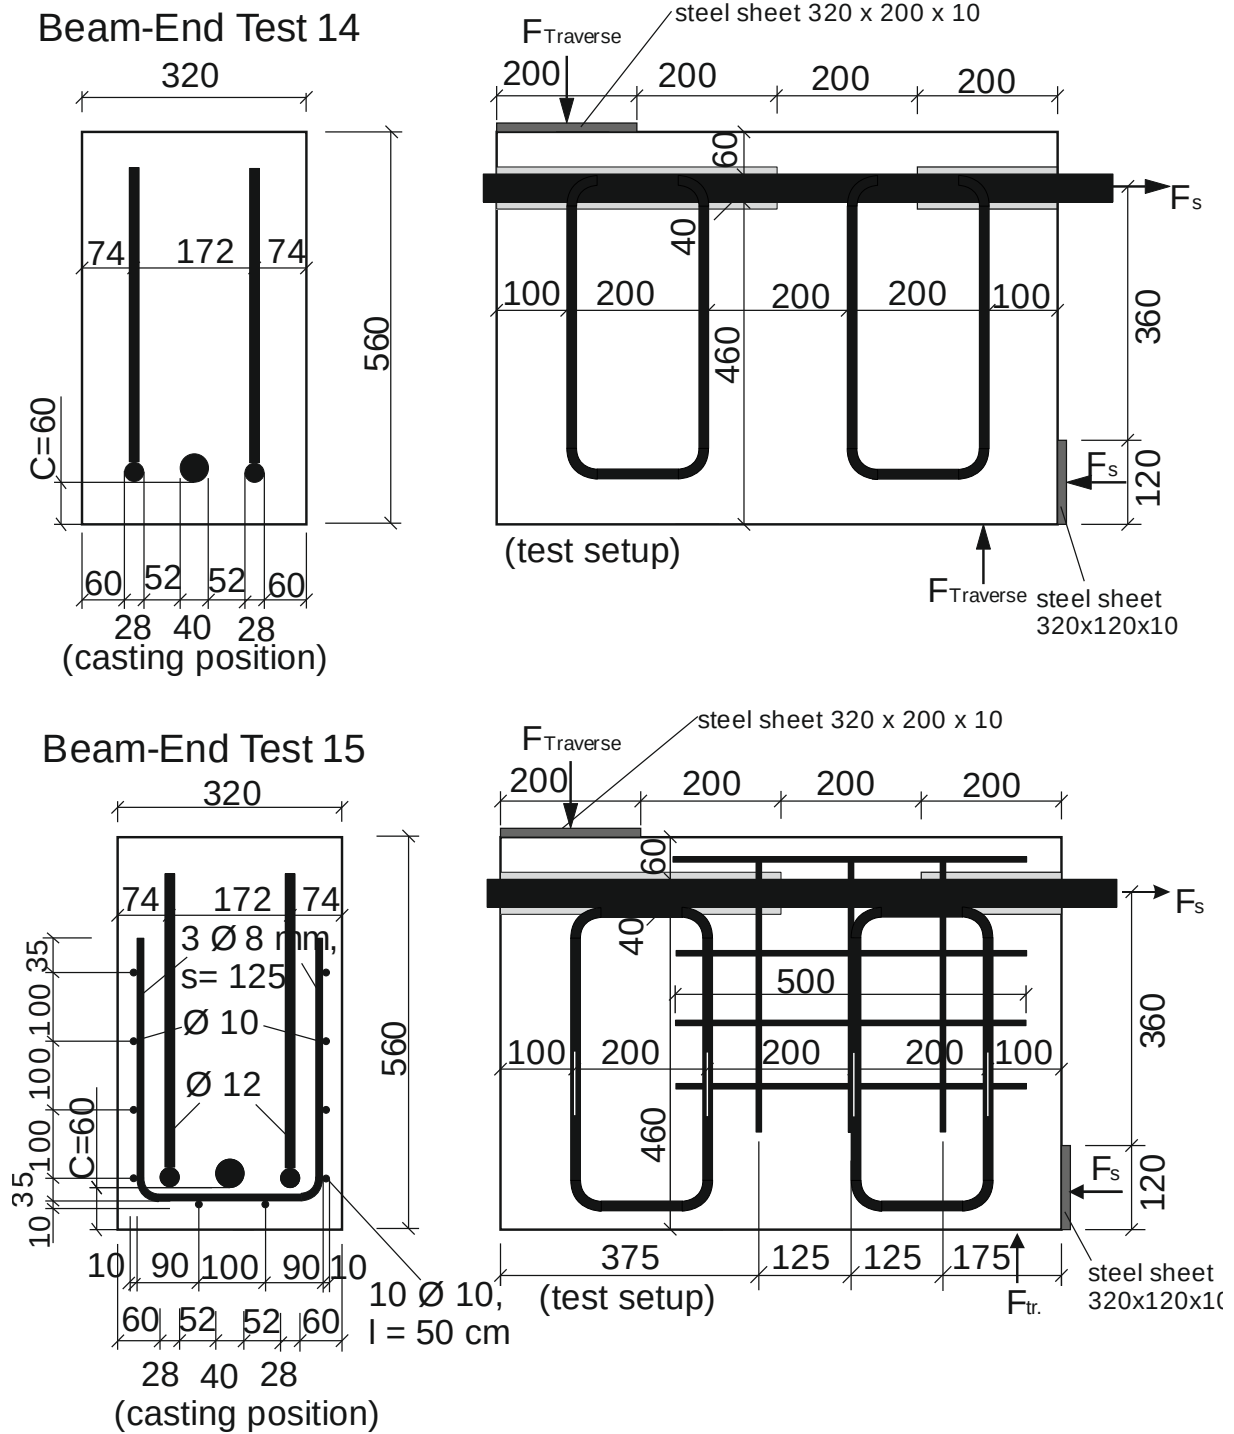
Reinforcement layout of Beam-End Tests 14 and 15
